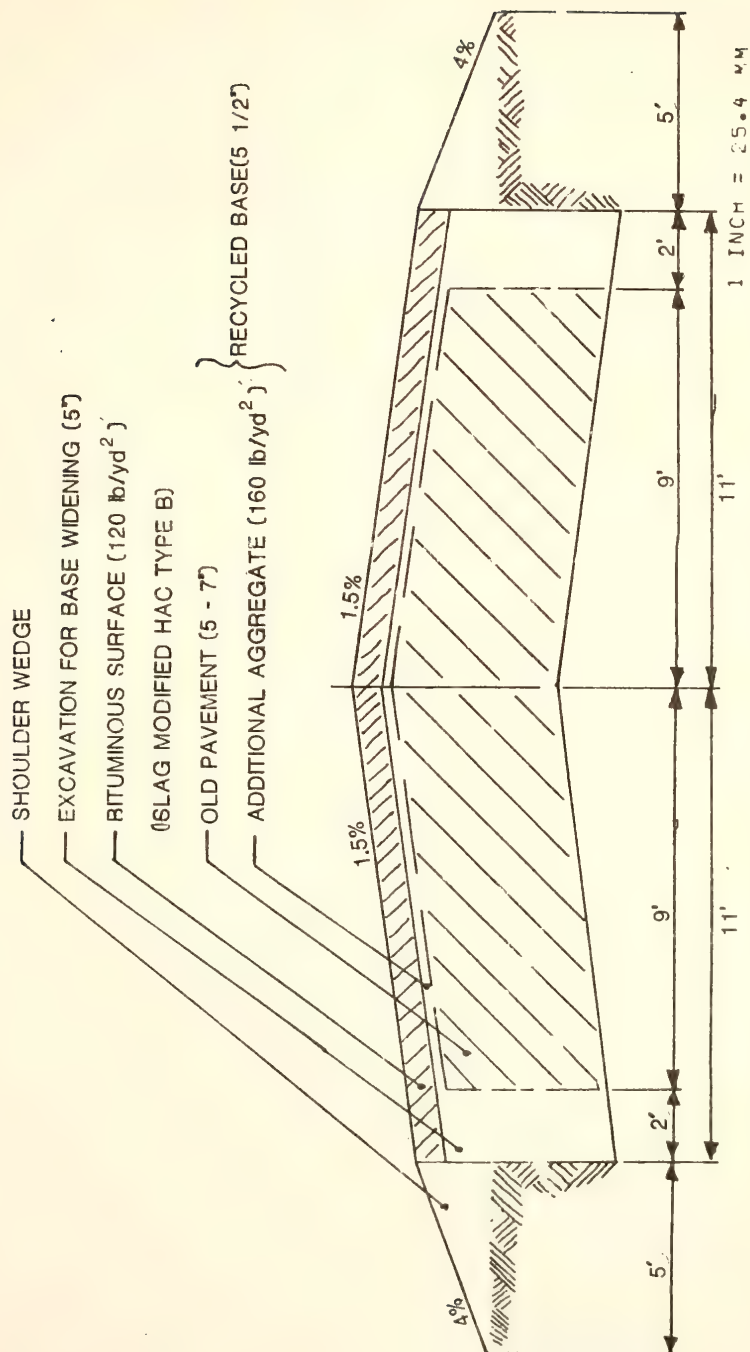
PROPOSED PAVEMENT CROSS SECTION
